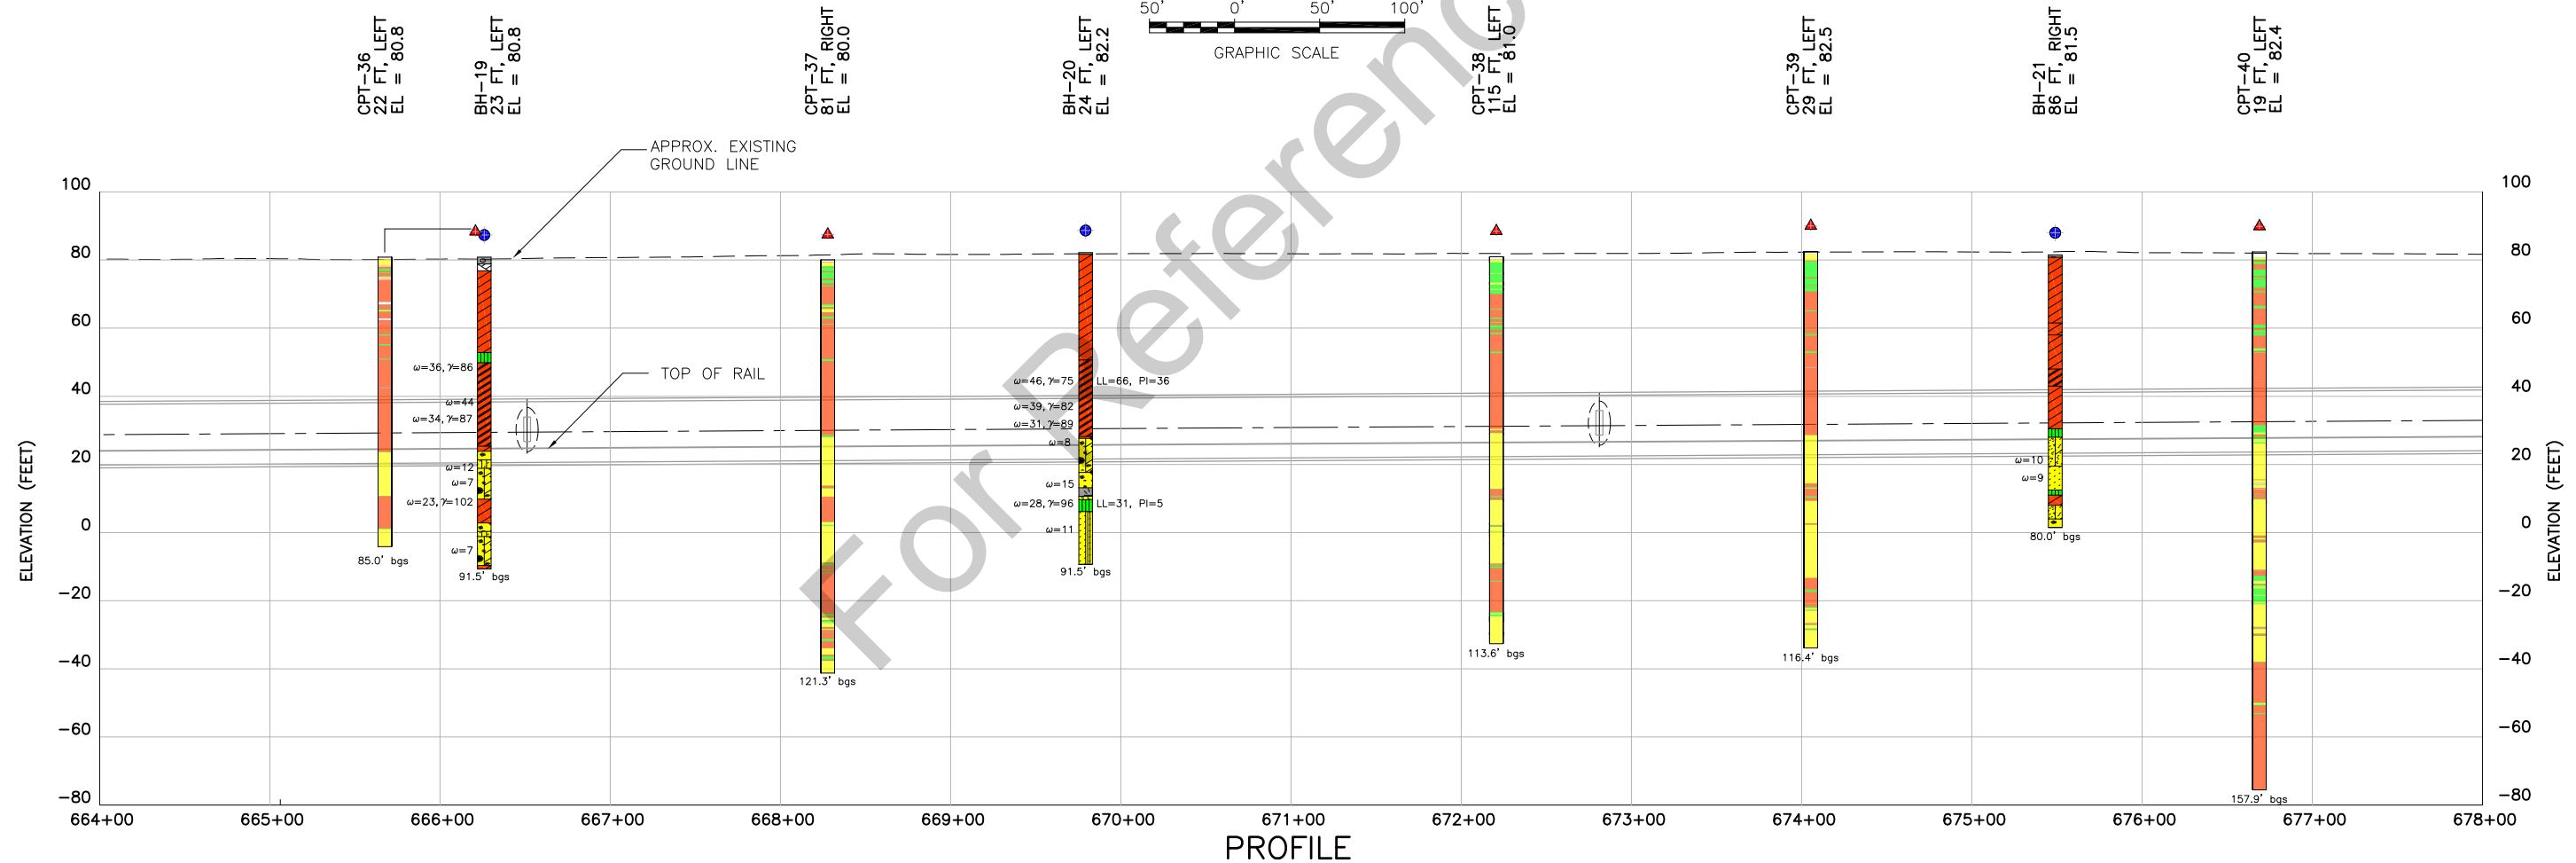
Geotechnical Plan and Profile with Classification Test
